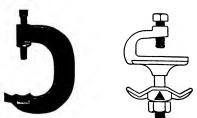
Clamps for Fastening Conduit to Structural Steel Courtesy of the M. B. Austin Co. and the Appleton Electric Co., Chicago
